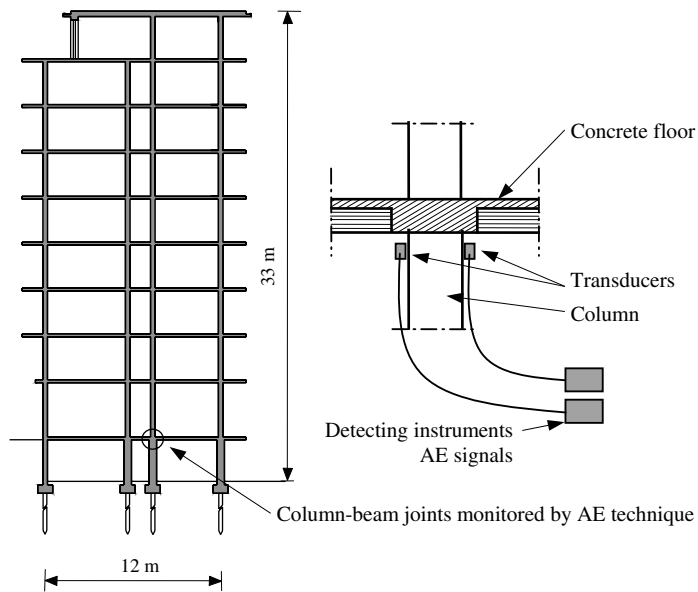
Building in Moncalieri. Structural section of the building and location of transducers on column-beam joints.
